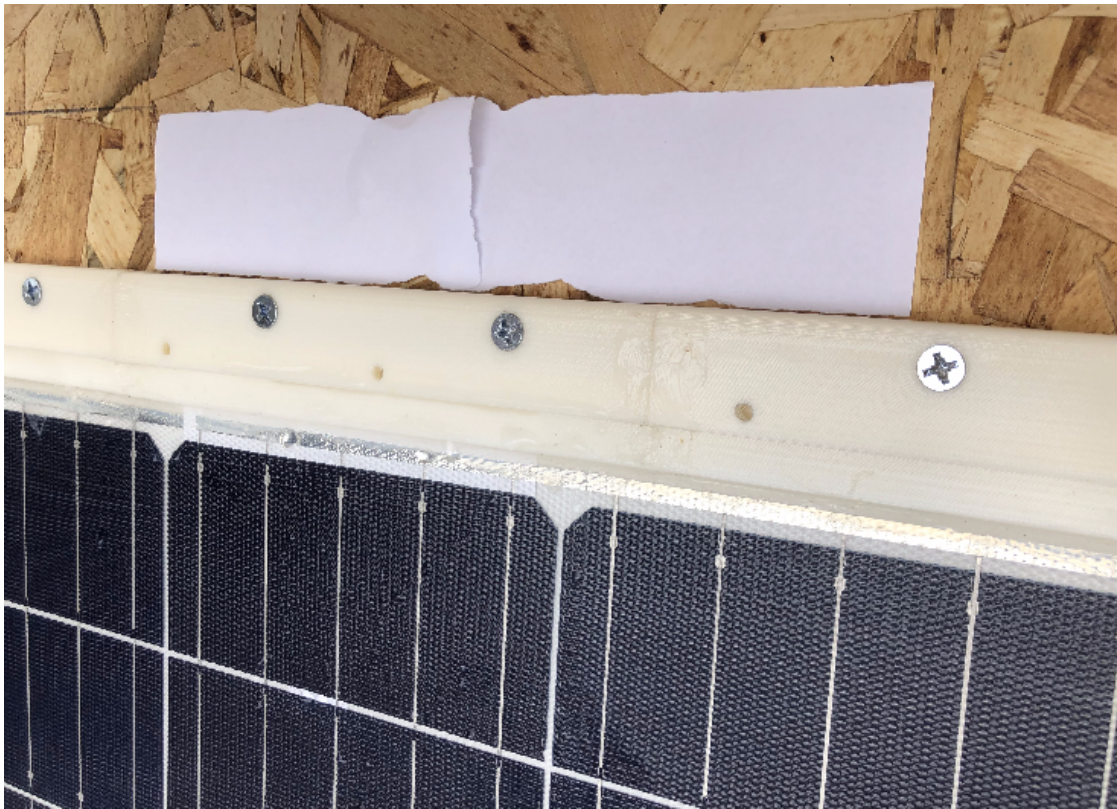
3rd round of testing, 45°, top fastener removed, paper on plywood only
